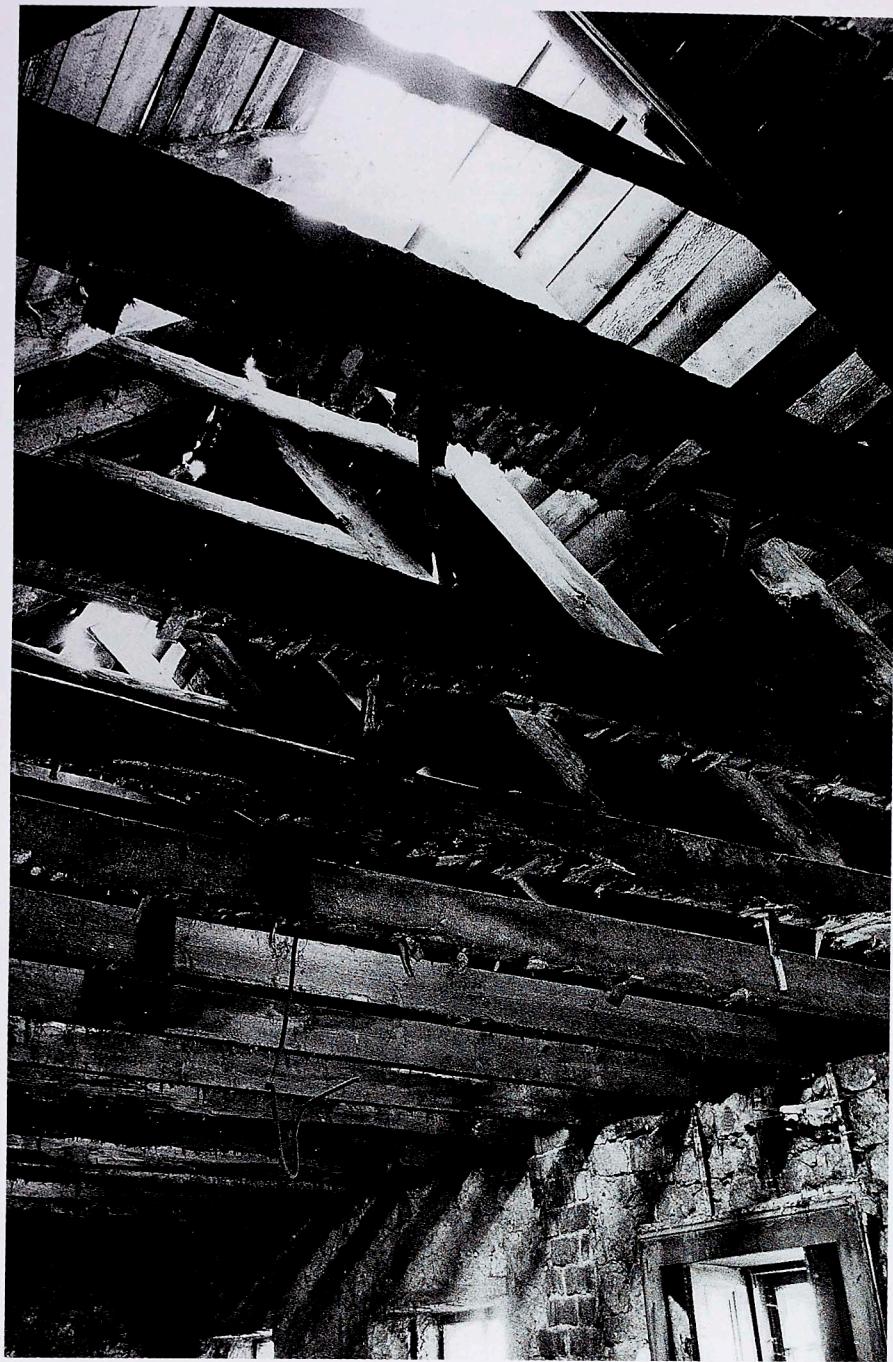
Interior of No. 11, showing tree-like timber in the roof space.
